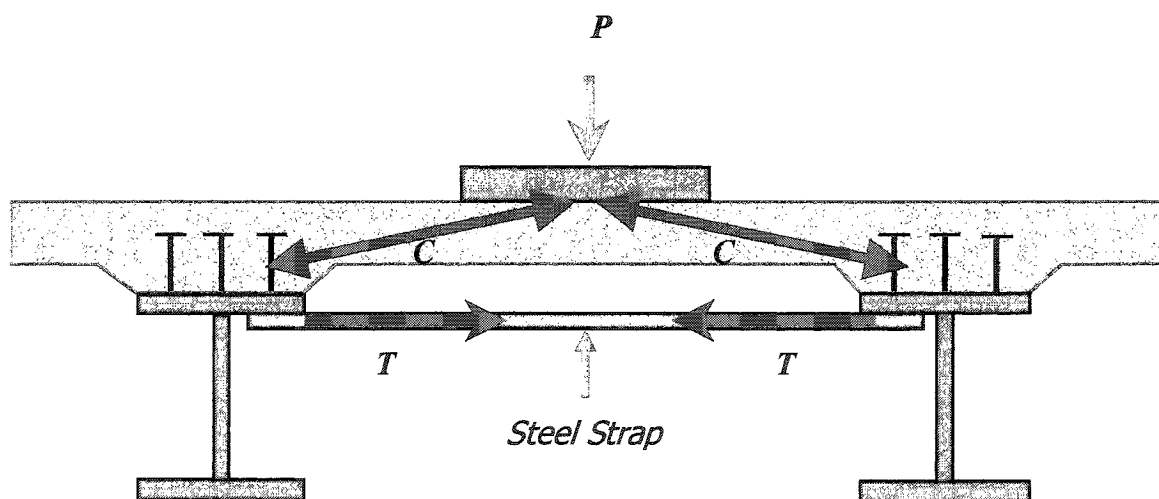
Schematic View of Steel-Free Bridge Deck
